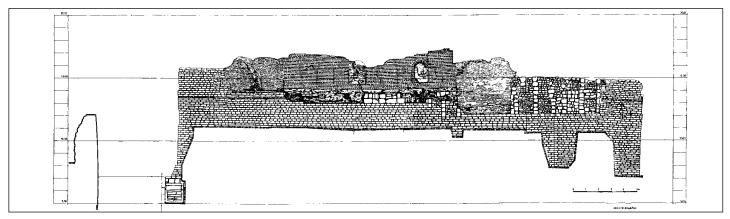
Cistern. North elevation after reconstruction (Drawing W. Kołątaj)
